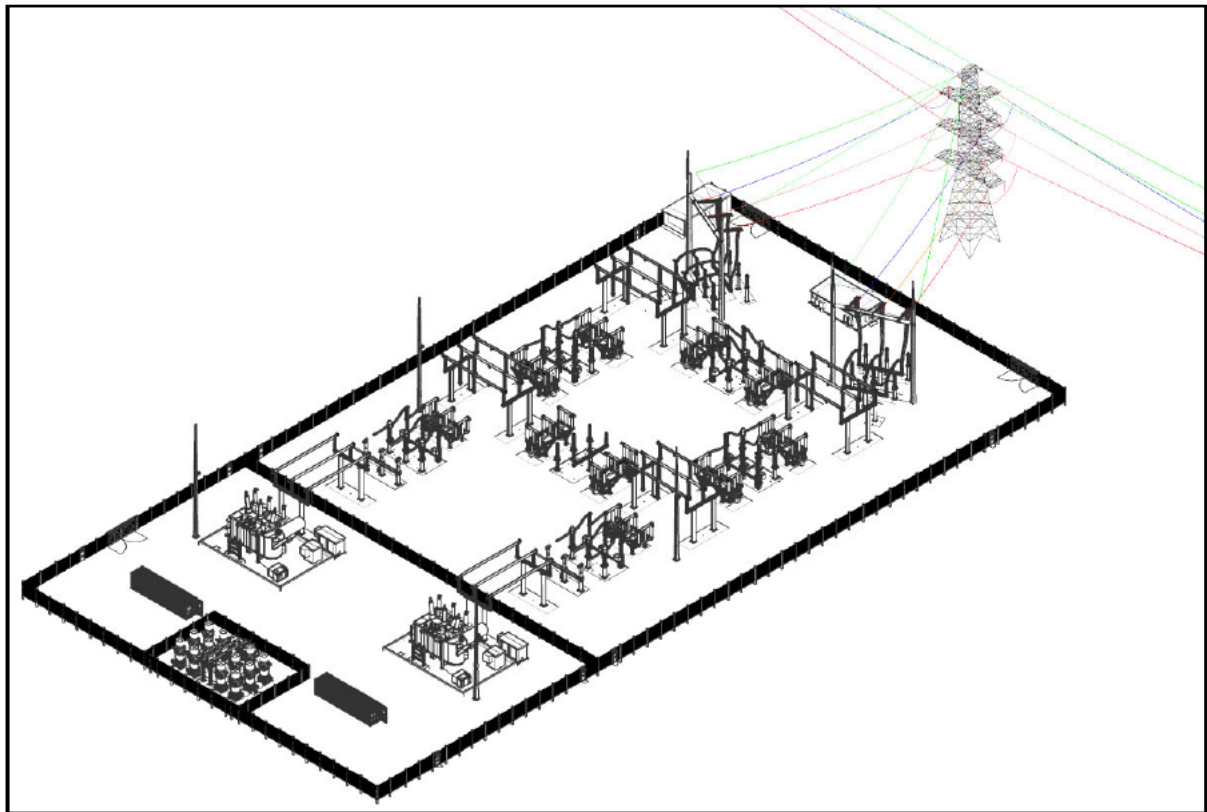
Haldon collector and 220 kV substation isometric drawing (refer to drawing 2429039-UP-006)
